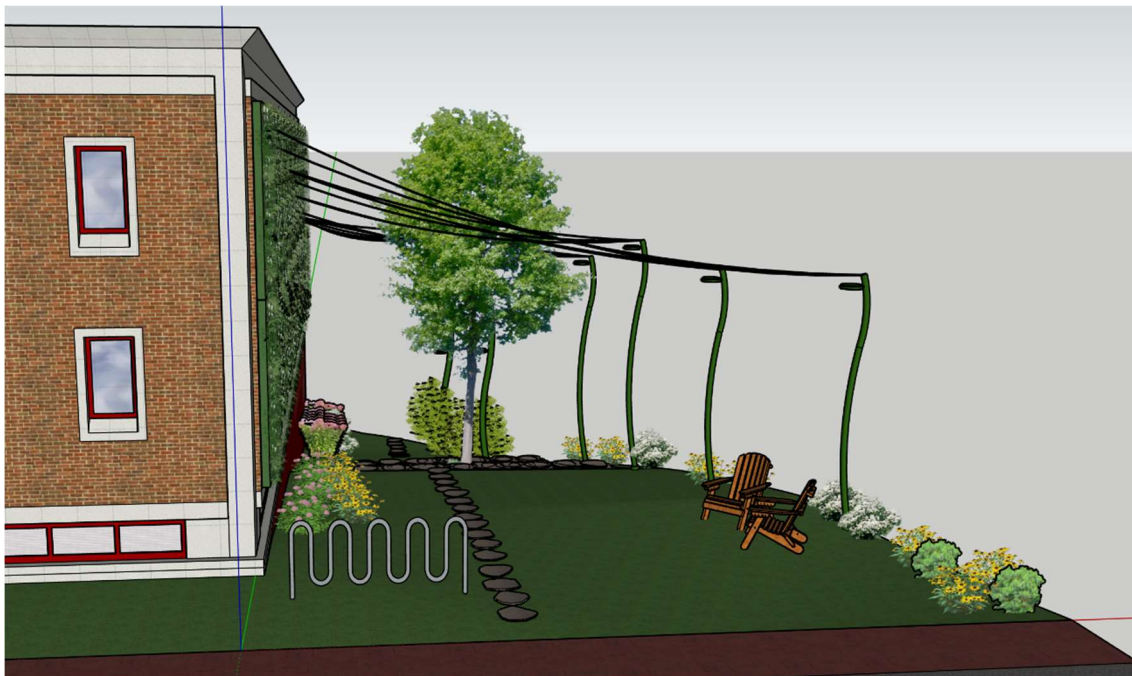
Rendering of the Lafayette Gardens: High Street View
